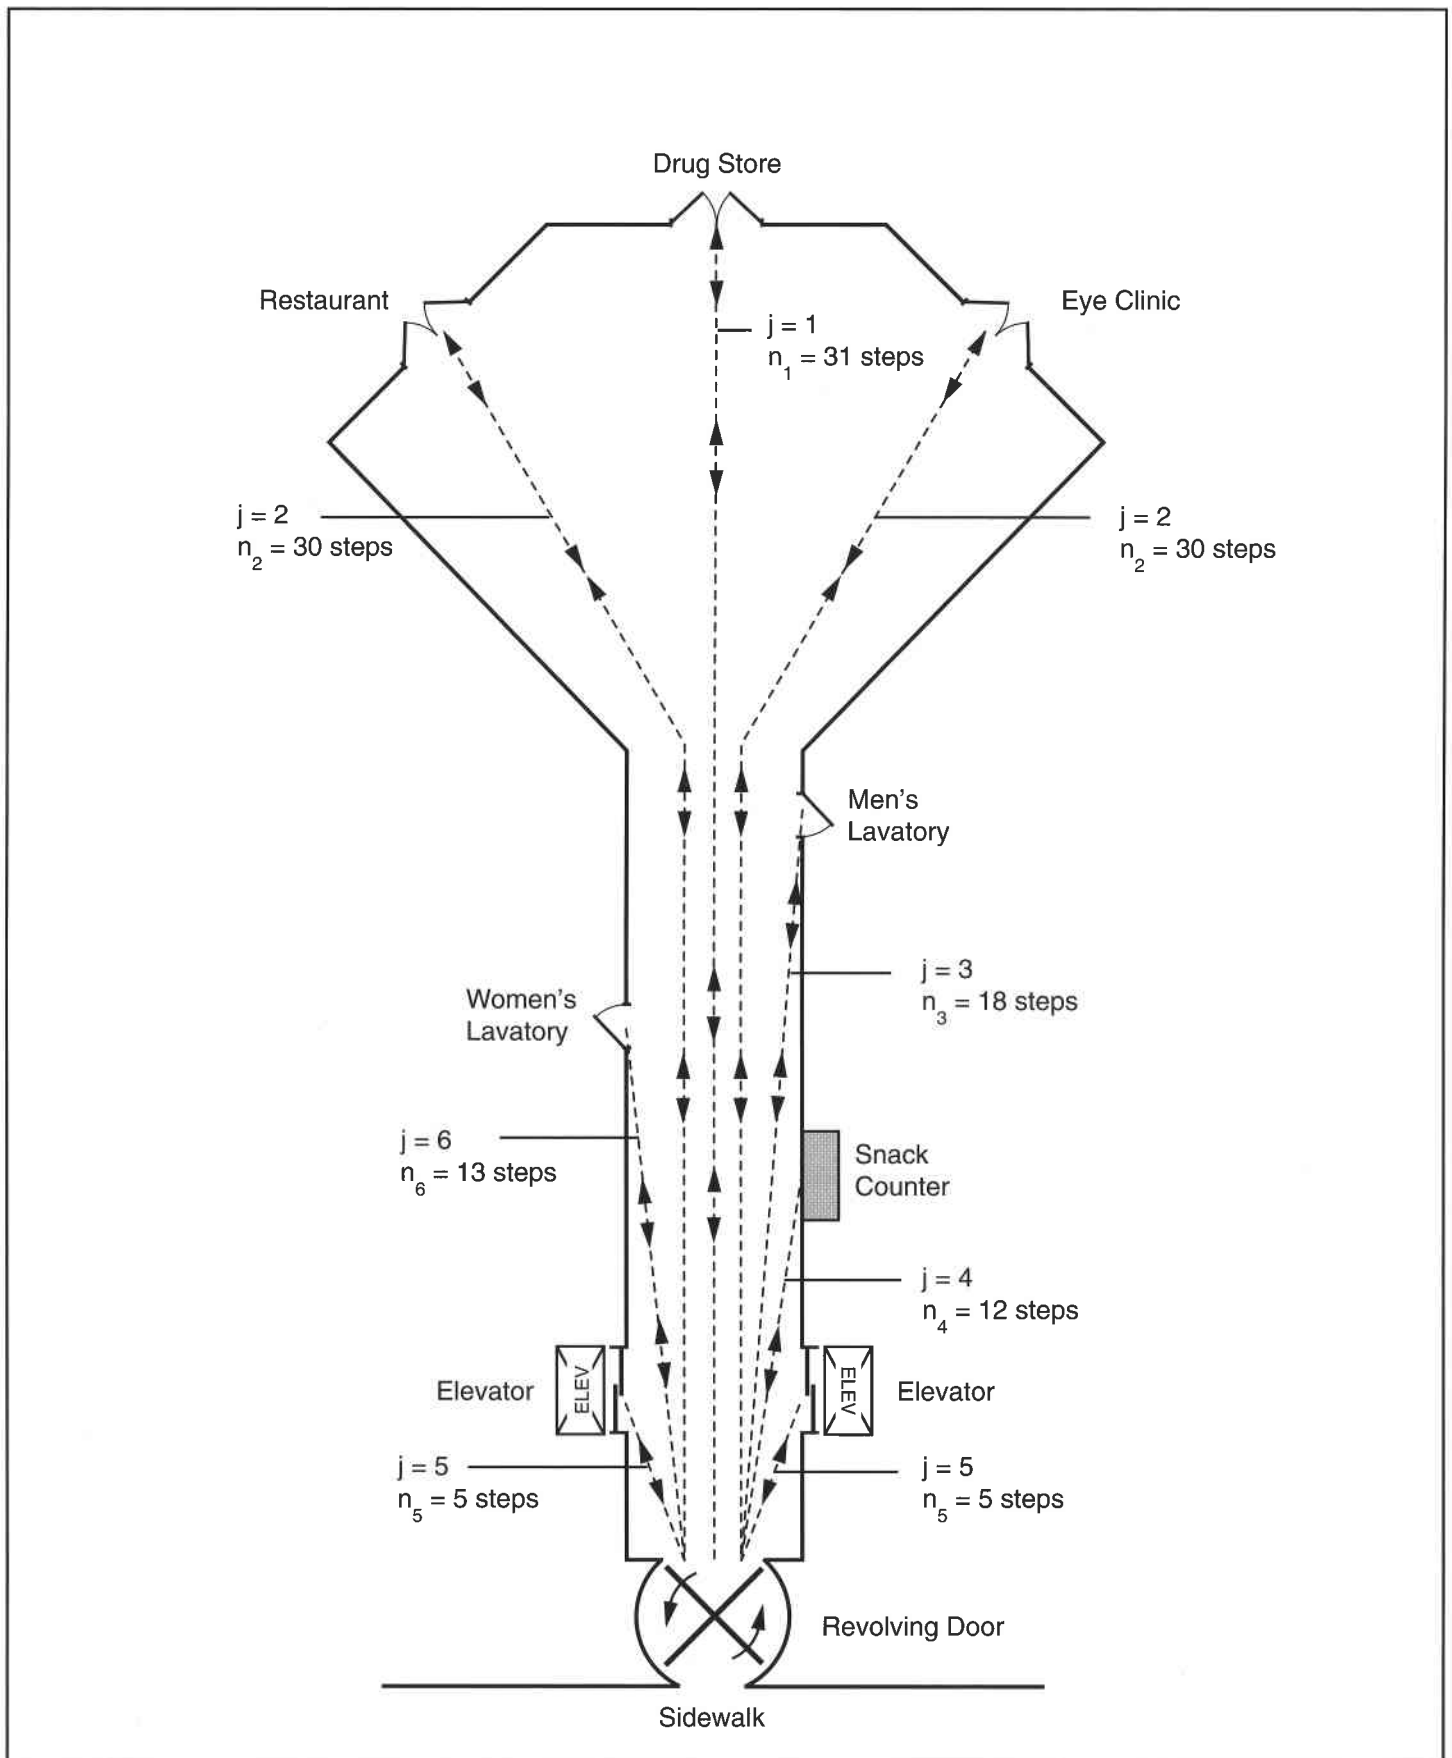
Commercial Floor Plan - Traffic Patterns, j
